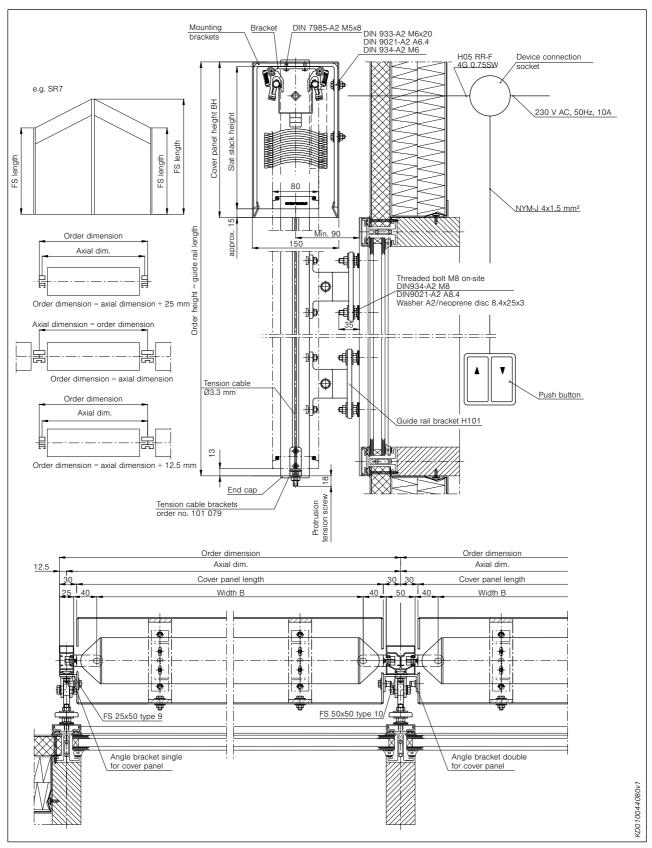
Group unit: Mounting cover panels between guide rails with SR.06, guide rails 25x50 and 50x50 mm
